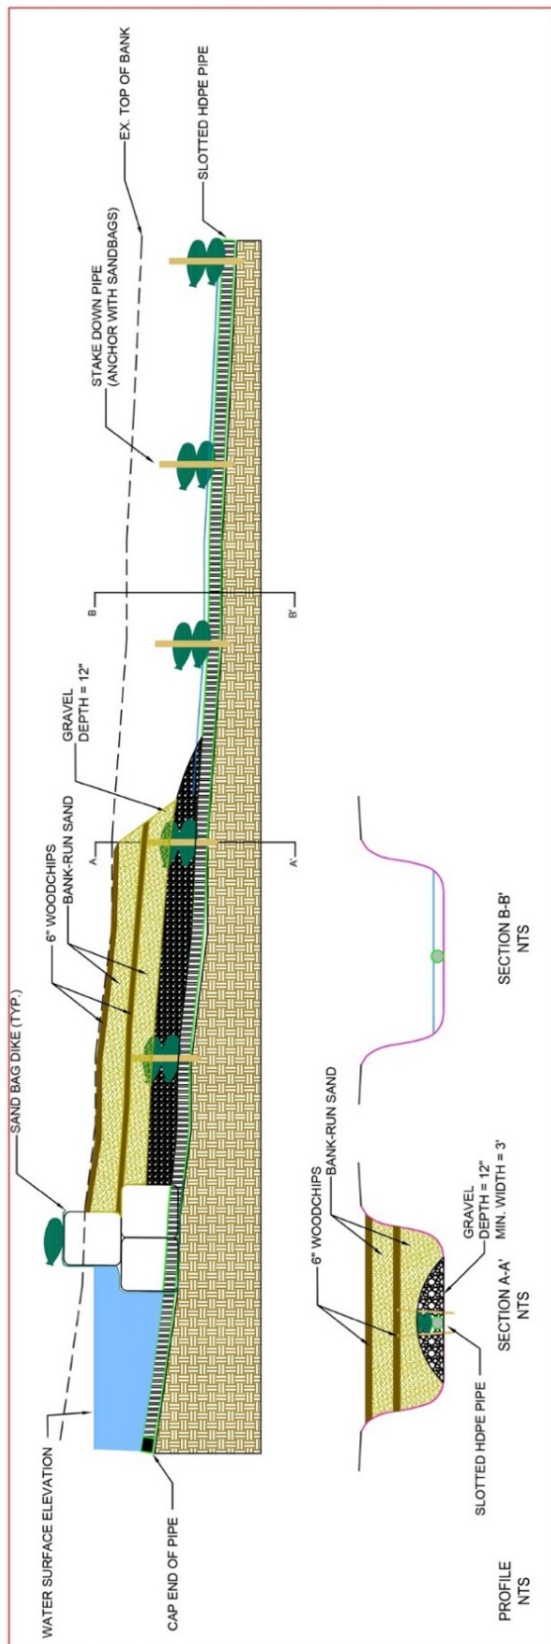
Profile and cross section of slotted pipe and gravel underdrain used to dewater the haul road. The underdrain pipe must be removed during pool excavation.
